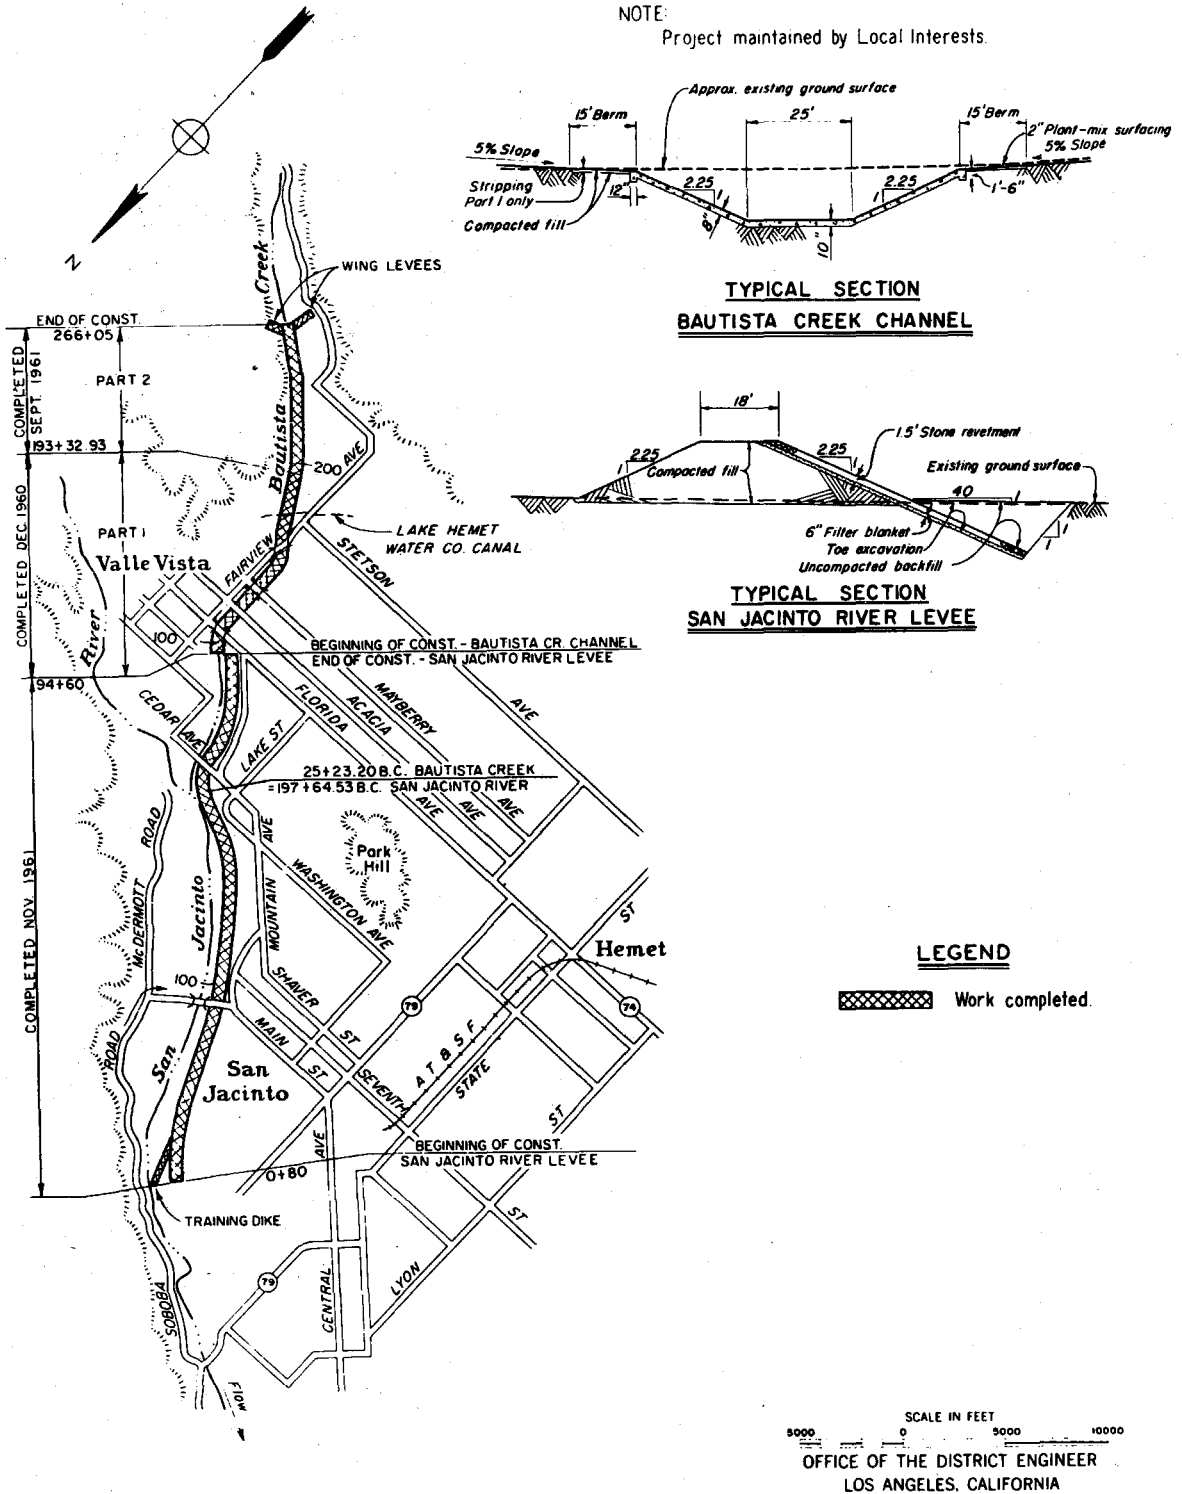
The San Jacinto River levee and Bautista Creek channel.
